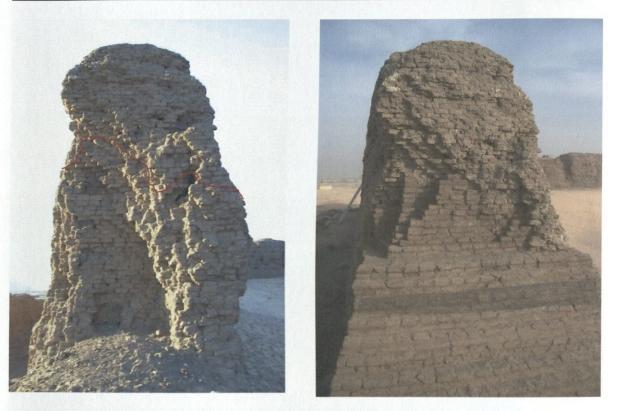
South end of the West Enclosure wall on the north side of the west gateway. Before condition on the left and after partial reconstruction on the right.
